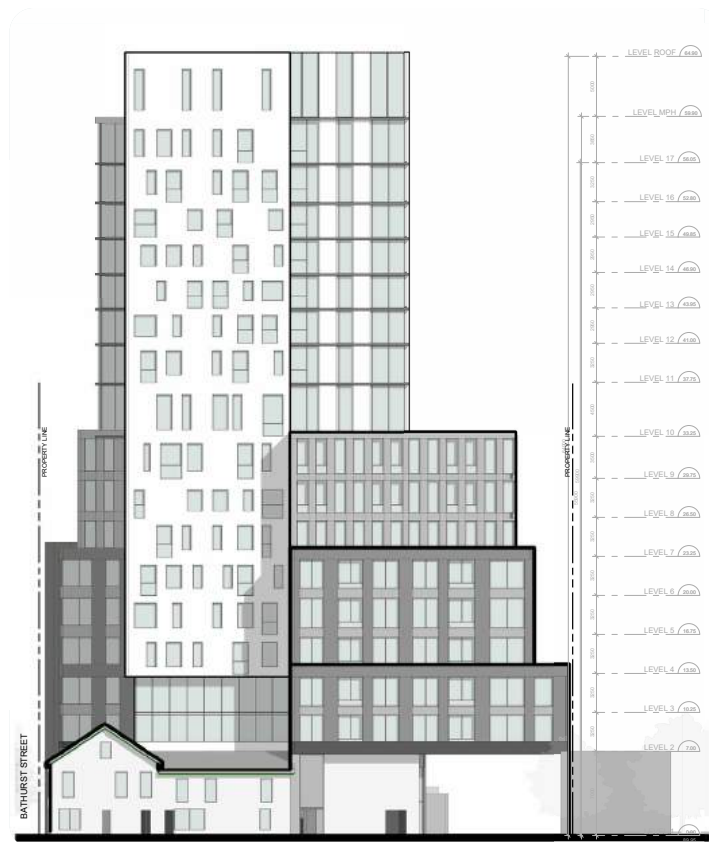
North Elevation (Prepared by Kirkor Architects)
